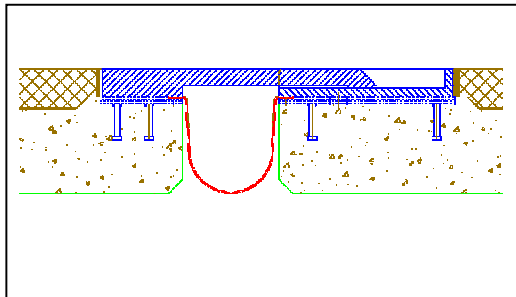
Sliding finger joint (steel/elastomer bonded system) - Cross-section.
